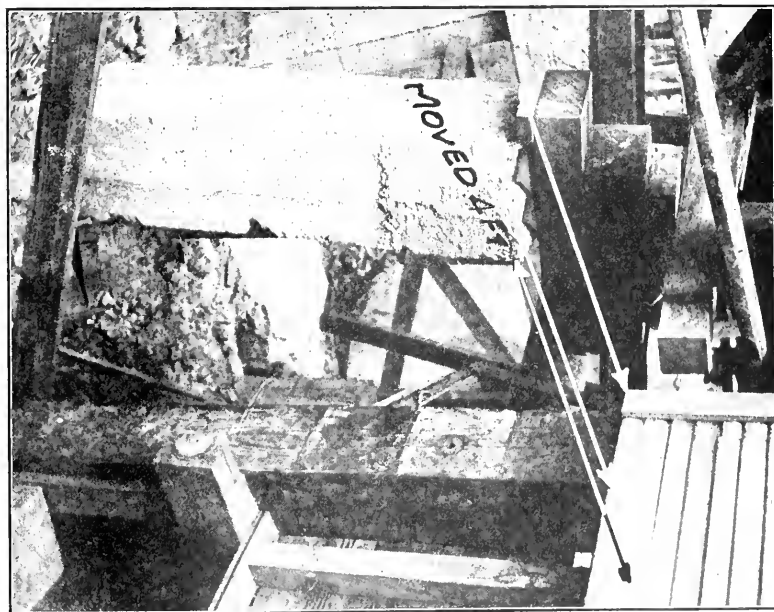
CONCRETE FOOTING UNDER CORNER OF ENGINE HOUSE.
